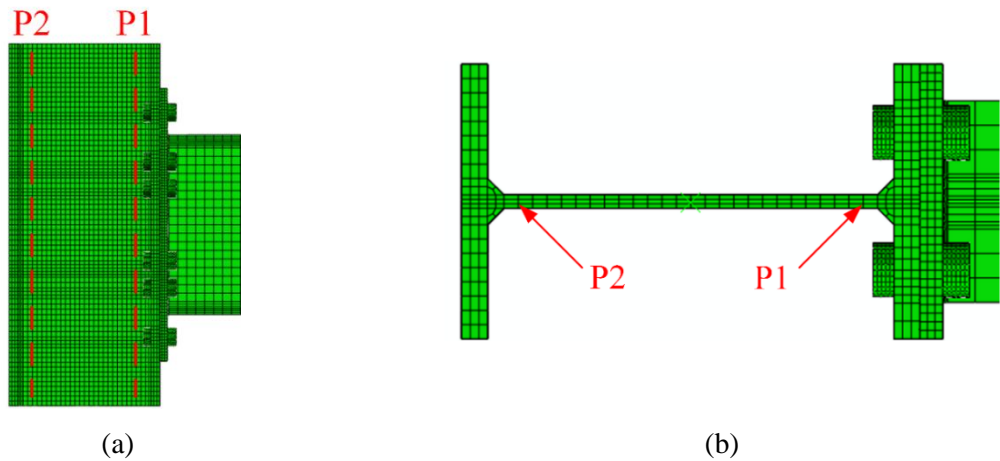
Location of the paths P1 and P2: (a) side elevation and (b) plan.
